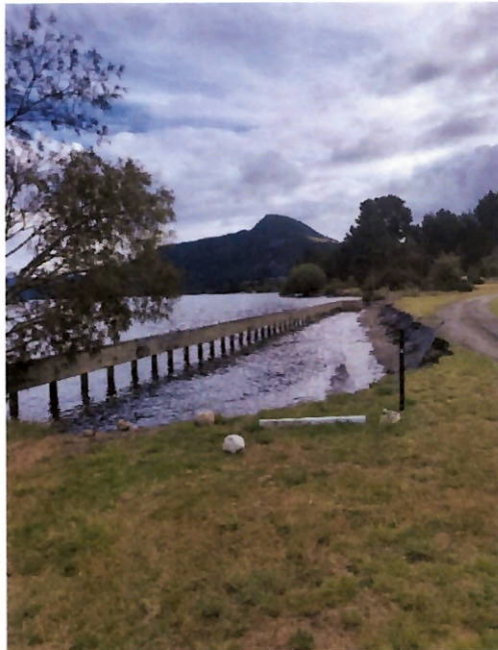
Existing timber wall, shoreline and access road to right of frame. Source: Tuwharetoa Maori Trust Board
